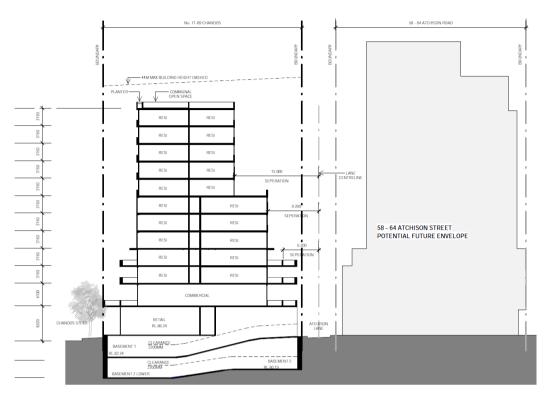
South elevation – separation distances (Applicant's Amended Architectural Drawings, p.22)
